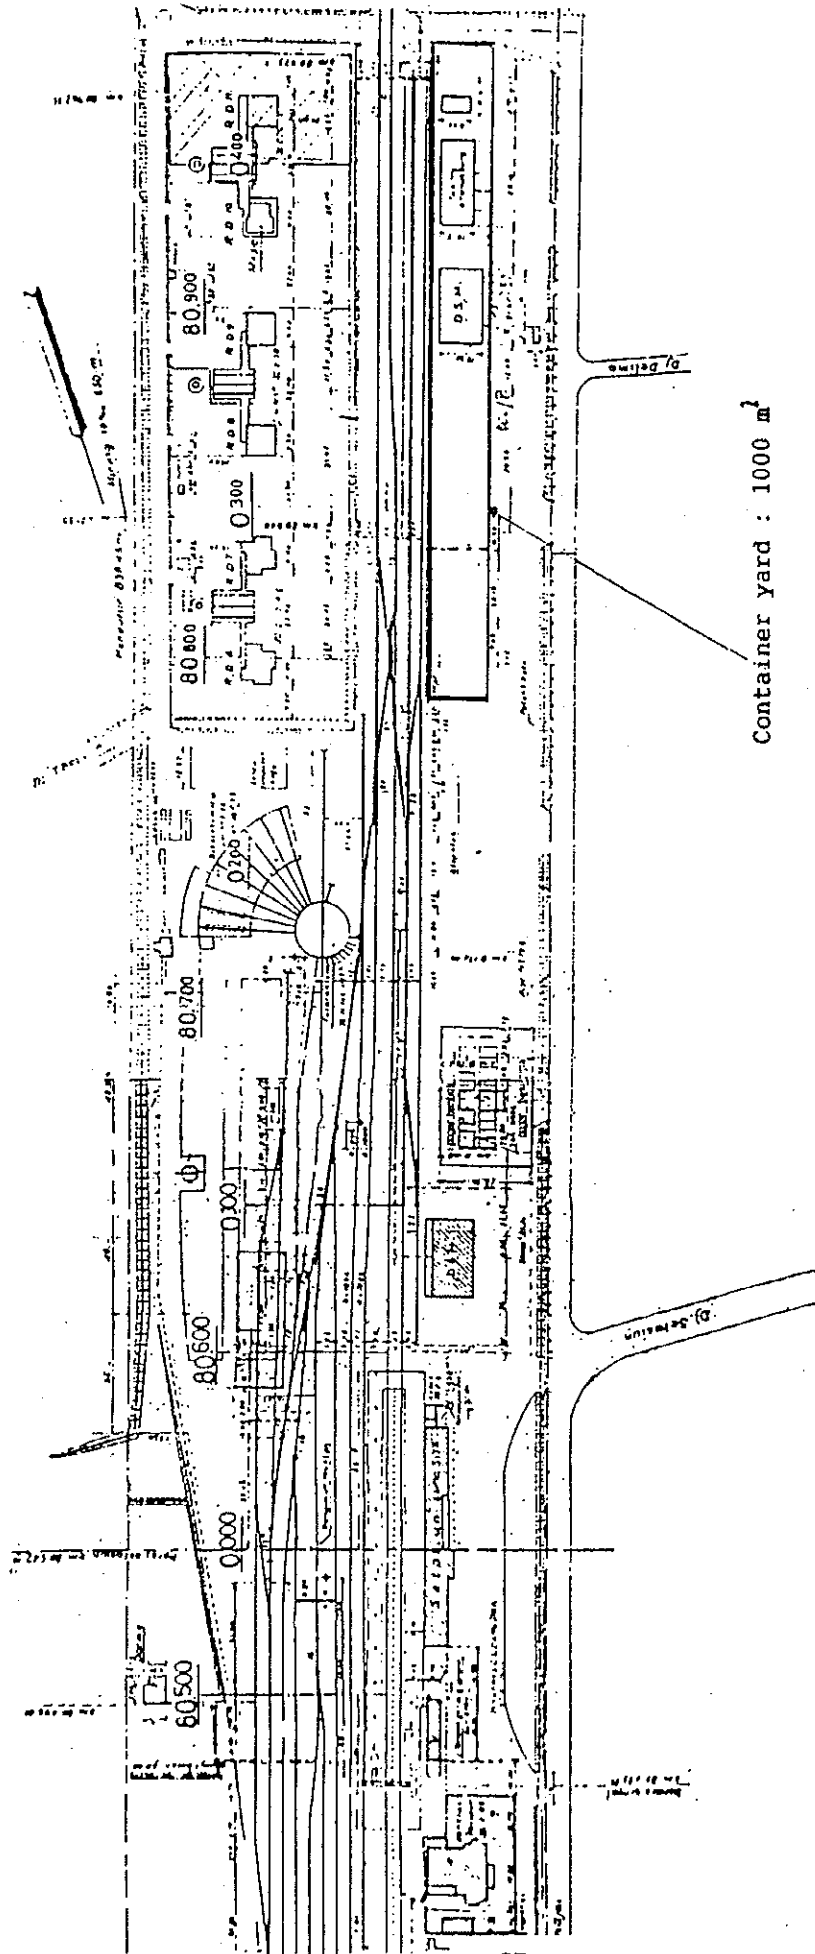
Layout of Tebing Tinggi Dry Port
